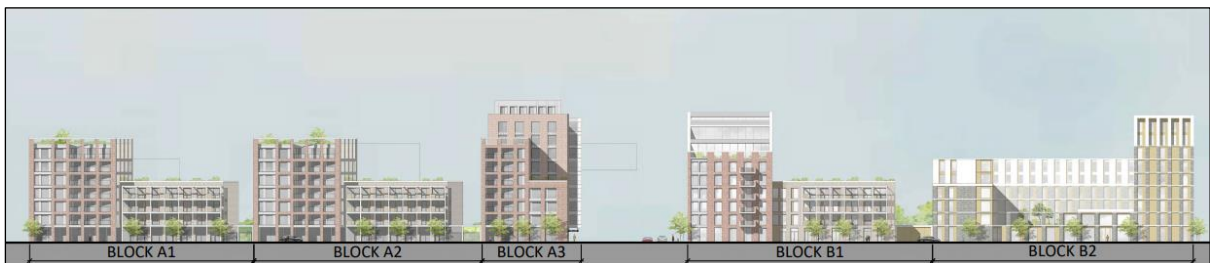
South contextual elevation of development proposed under An Bord Pleanála Case No. 303306.
